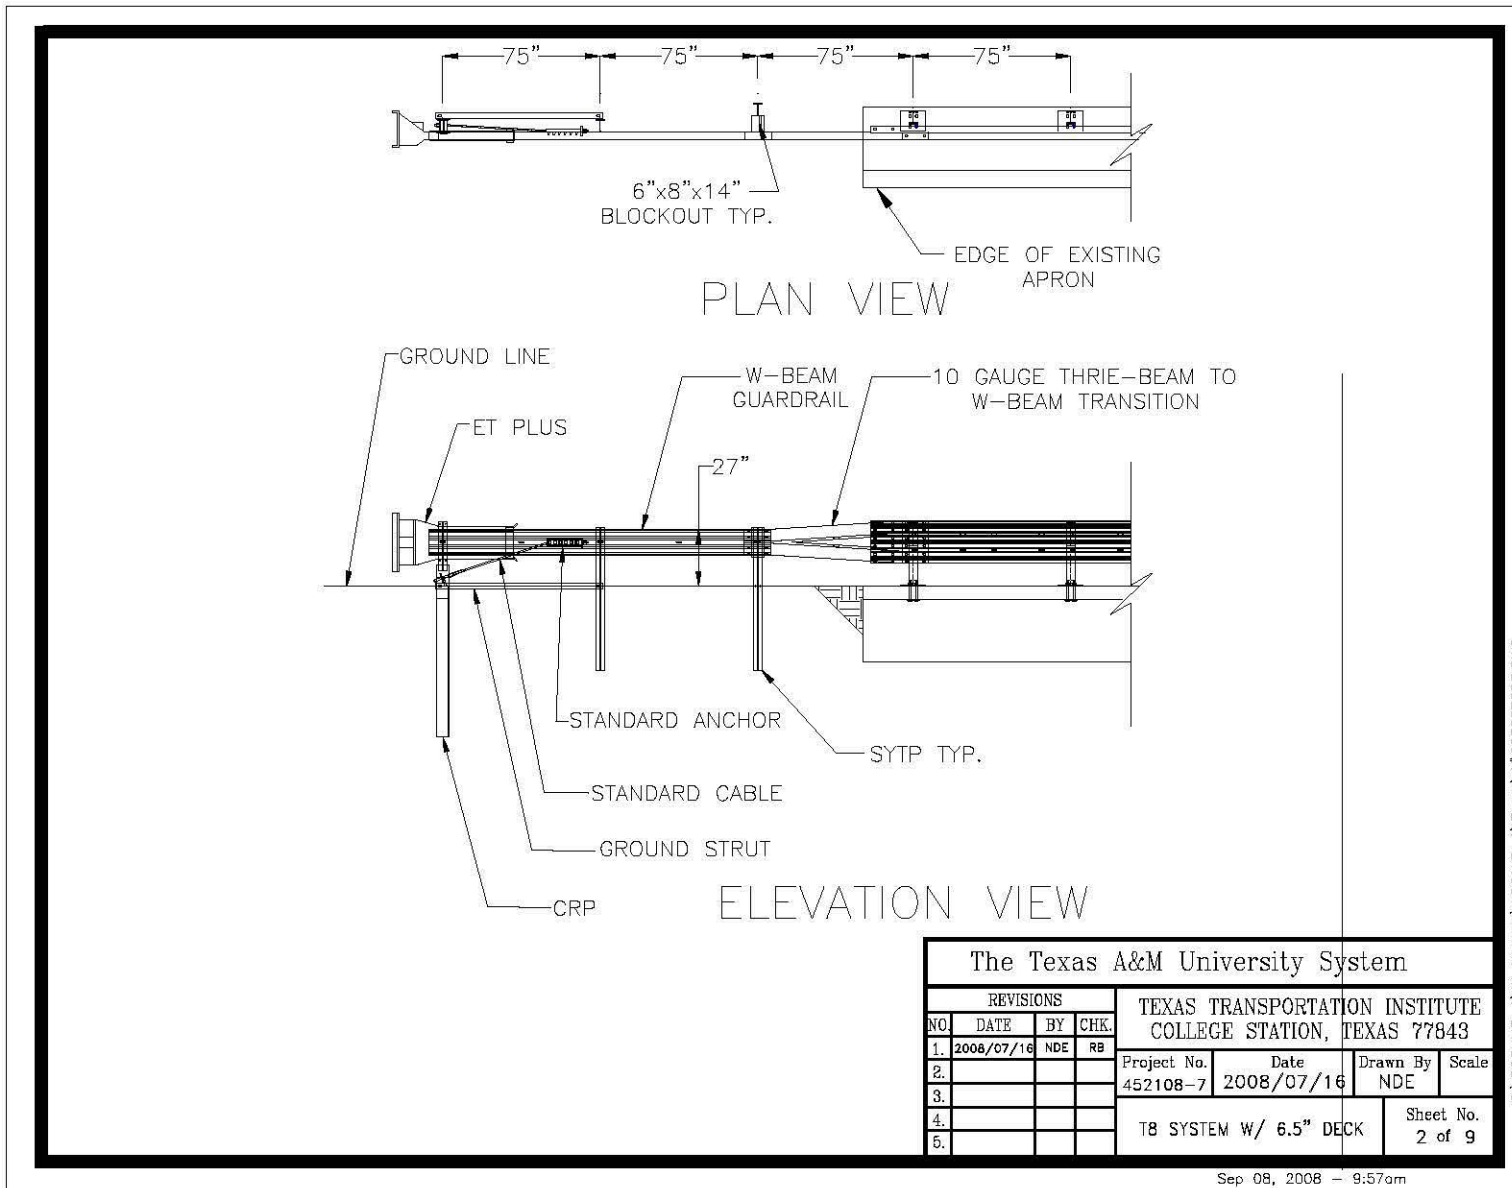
Details of the T8 Bridge Rail Installation – Terminal Details.
